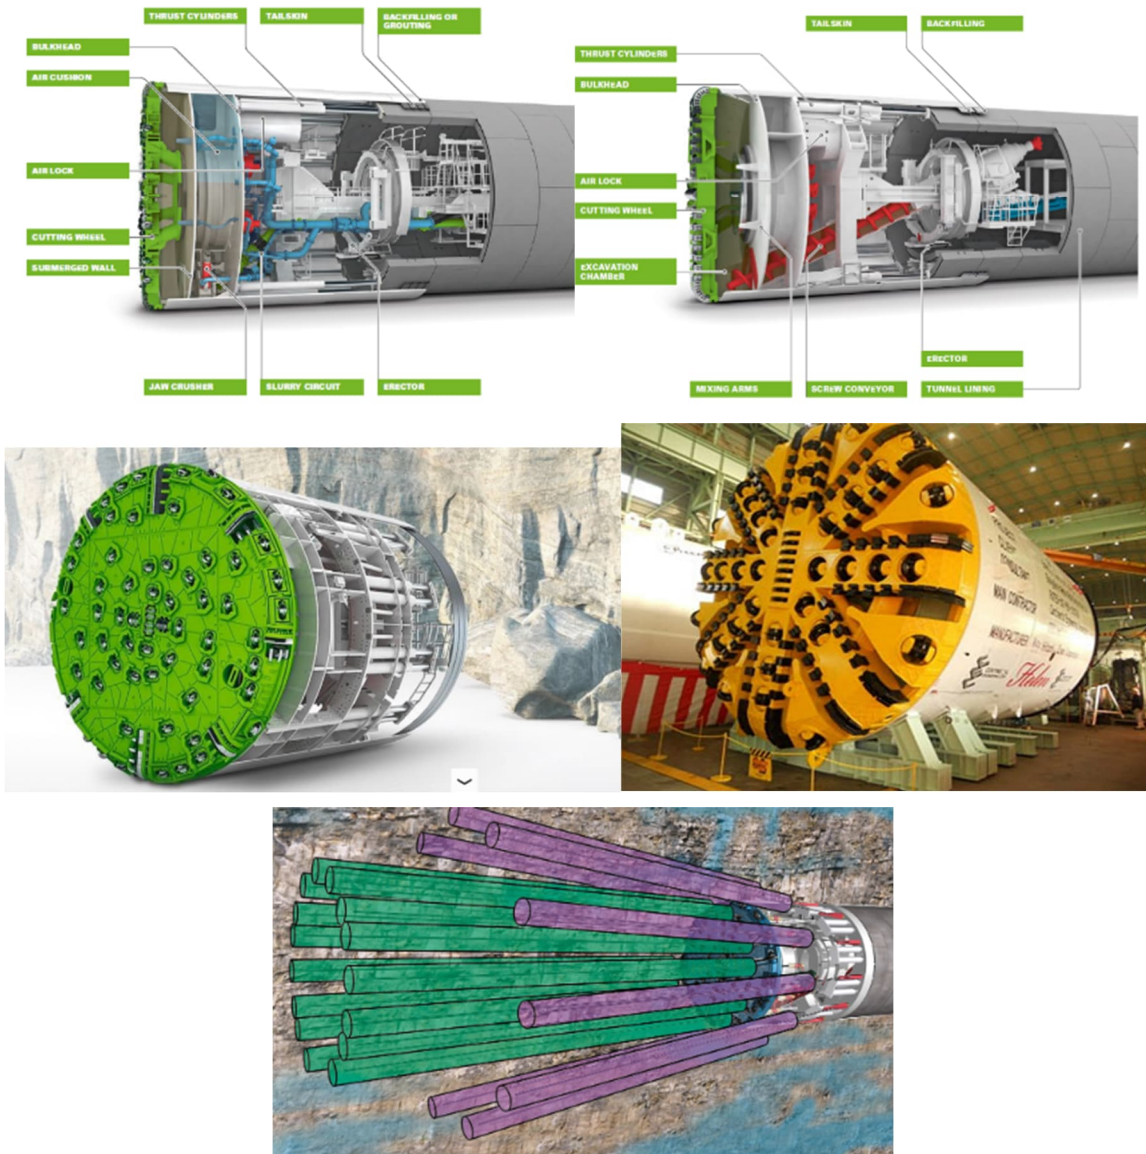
(Top Left) Slurry Tunnel Boring Machine; (Top Right) Earth Pressure Balance Tunnel-Boring Machine; (Center) Single-Shield Tunnel-Boring Machines; (Bottom) Probing and Grouting Capability
